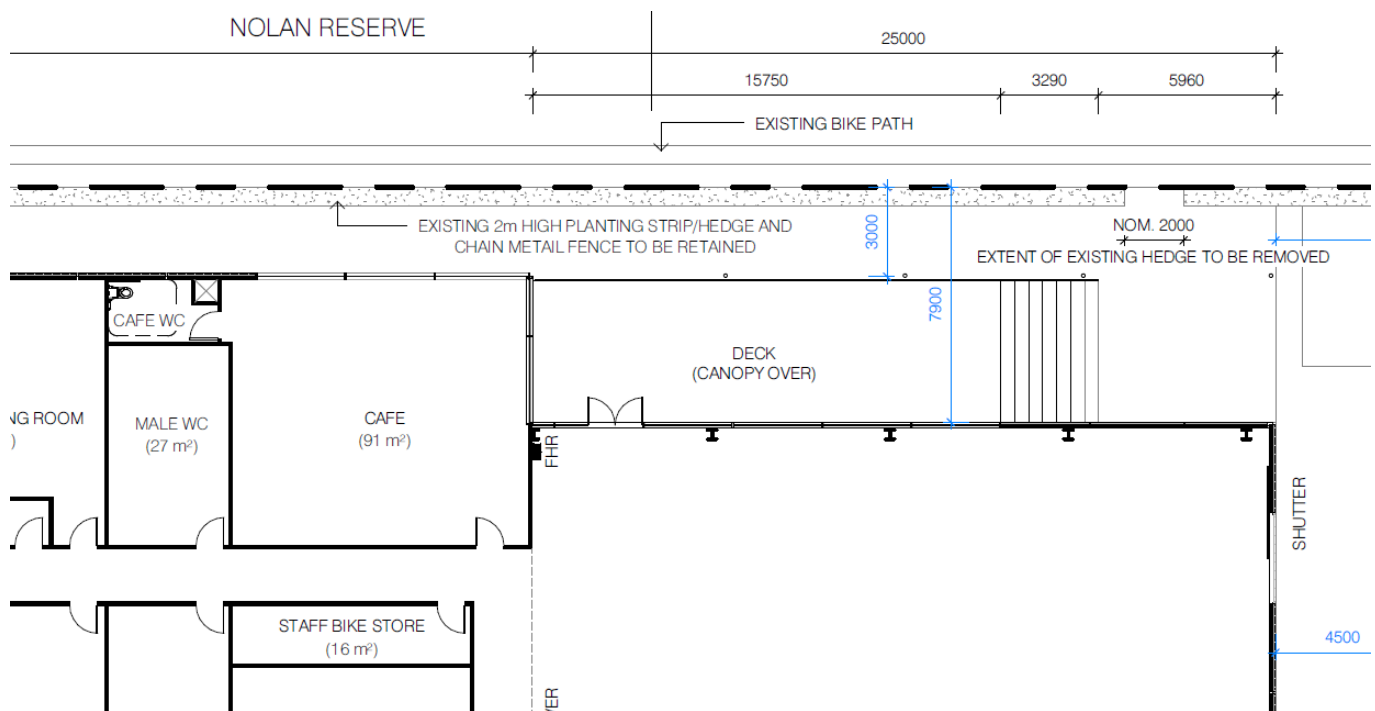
Extract of DA Lodgement Ground Floor Plan
